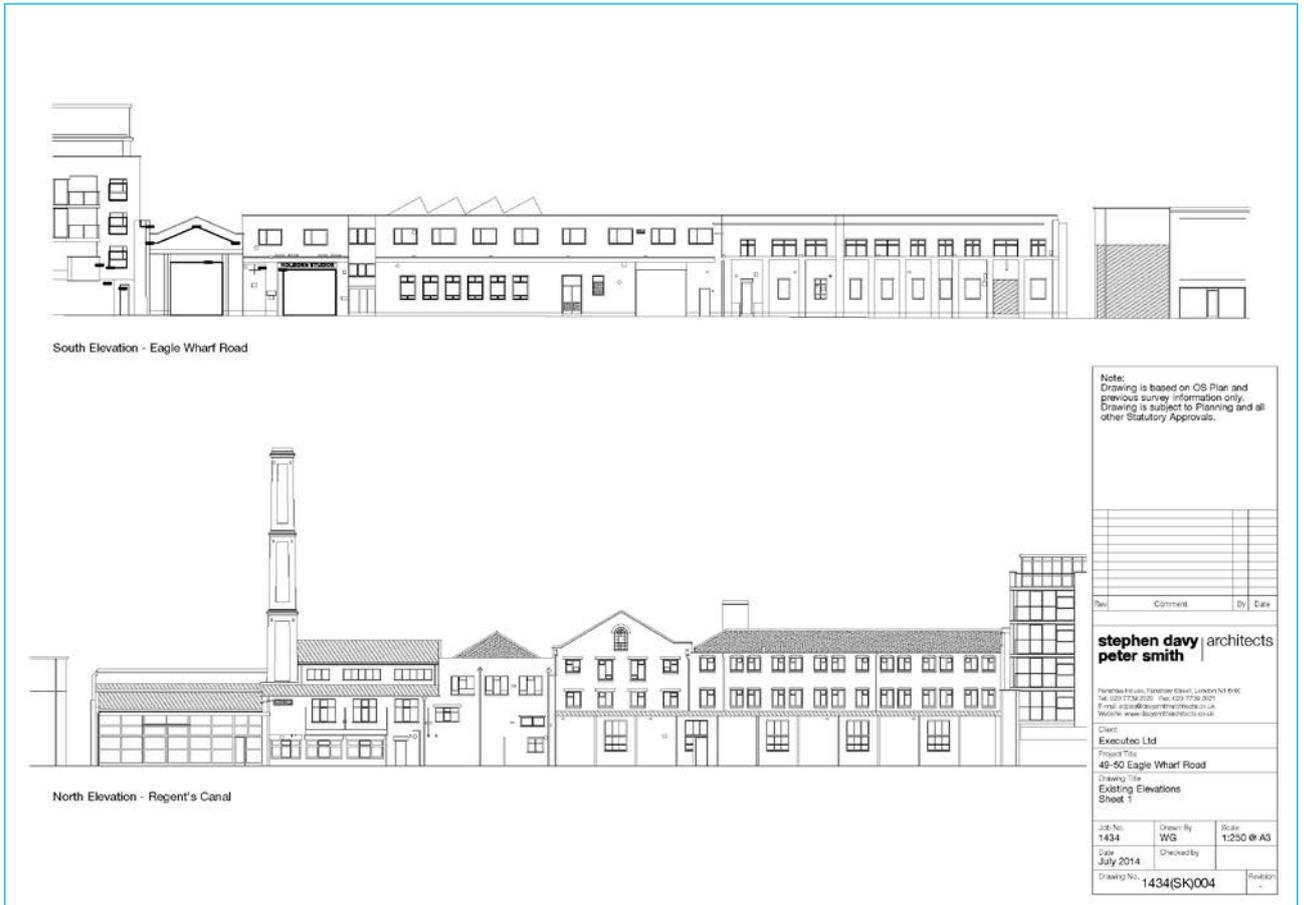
Existing elevations (Drawing 1434(SK)004, dated July 2014). For a larger plan see the pdf document submitted with planning application.
